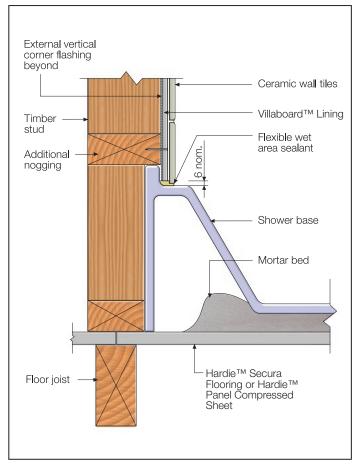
A PREFORMED TRAY DETAIL FOR VILLABOARD™ LINING TO BE TILED - TIMBER FRAME
